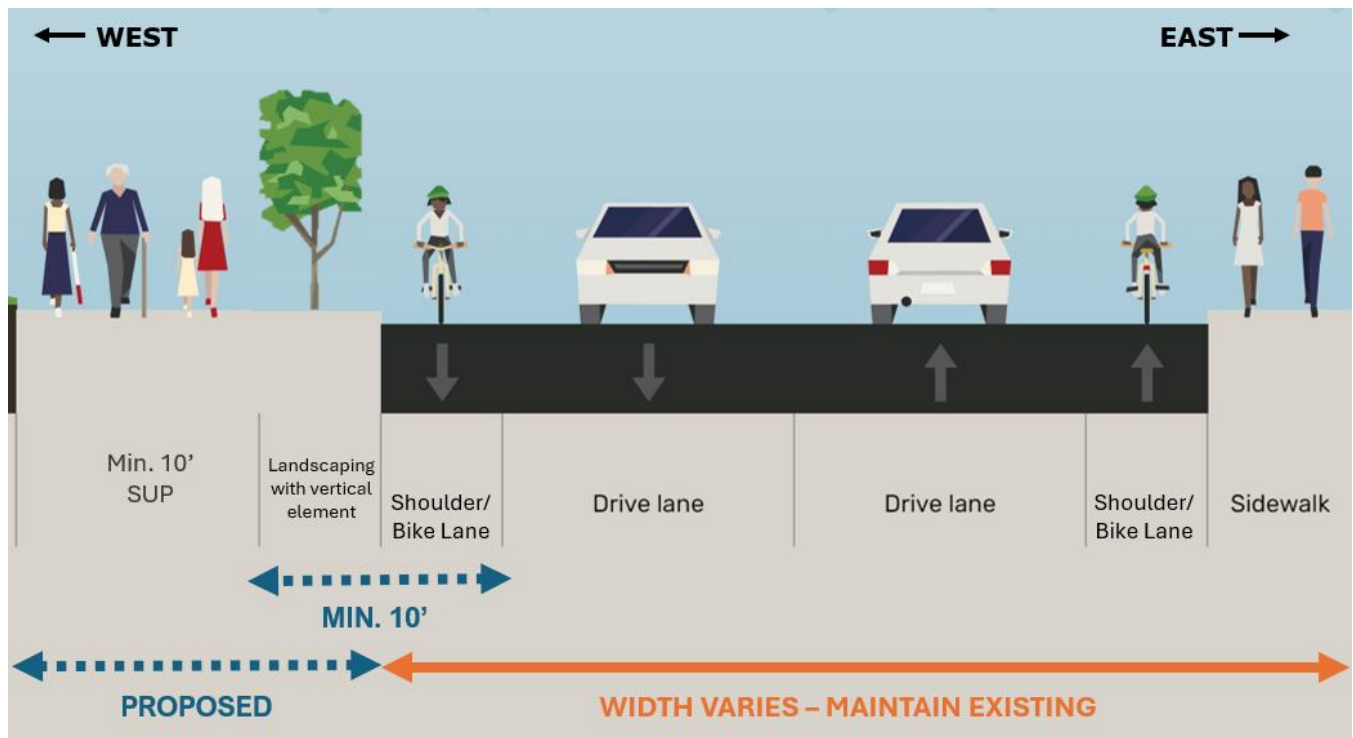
RECOMMENDED CROSS SECTION ELEMENTS ON SE 15TH STREET SOUTH OF REED MARKET ROAD TO ACHIEVE BLTS/PLTS 1 VIA A SHARED USE PATH
